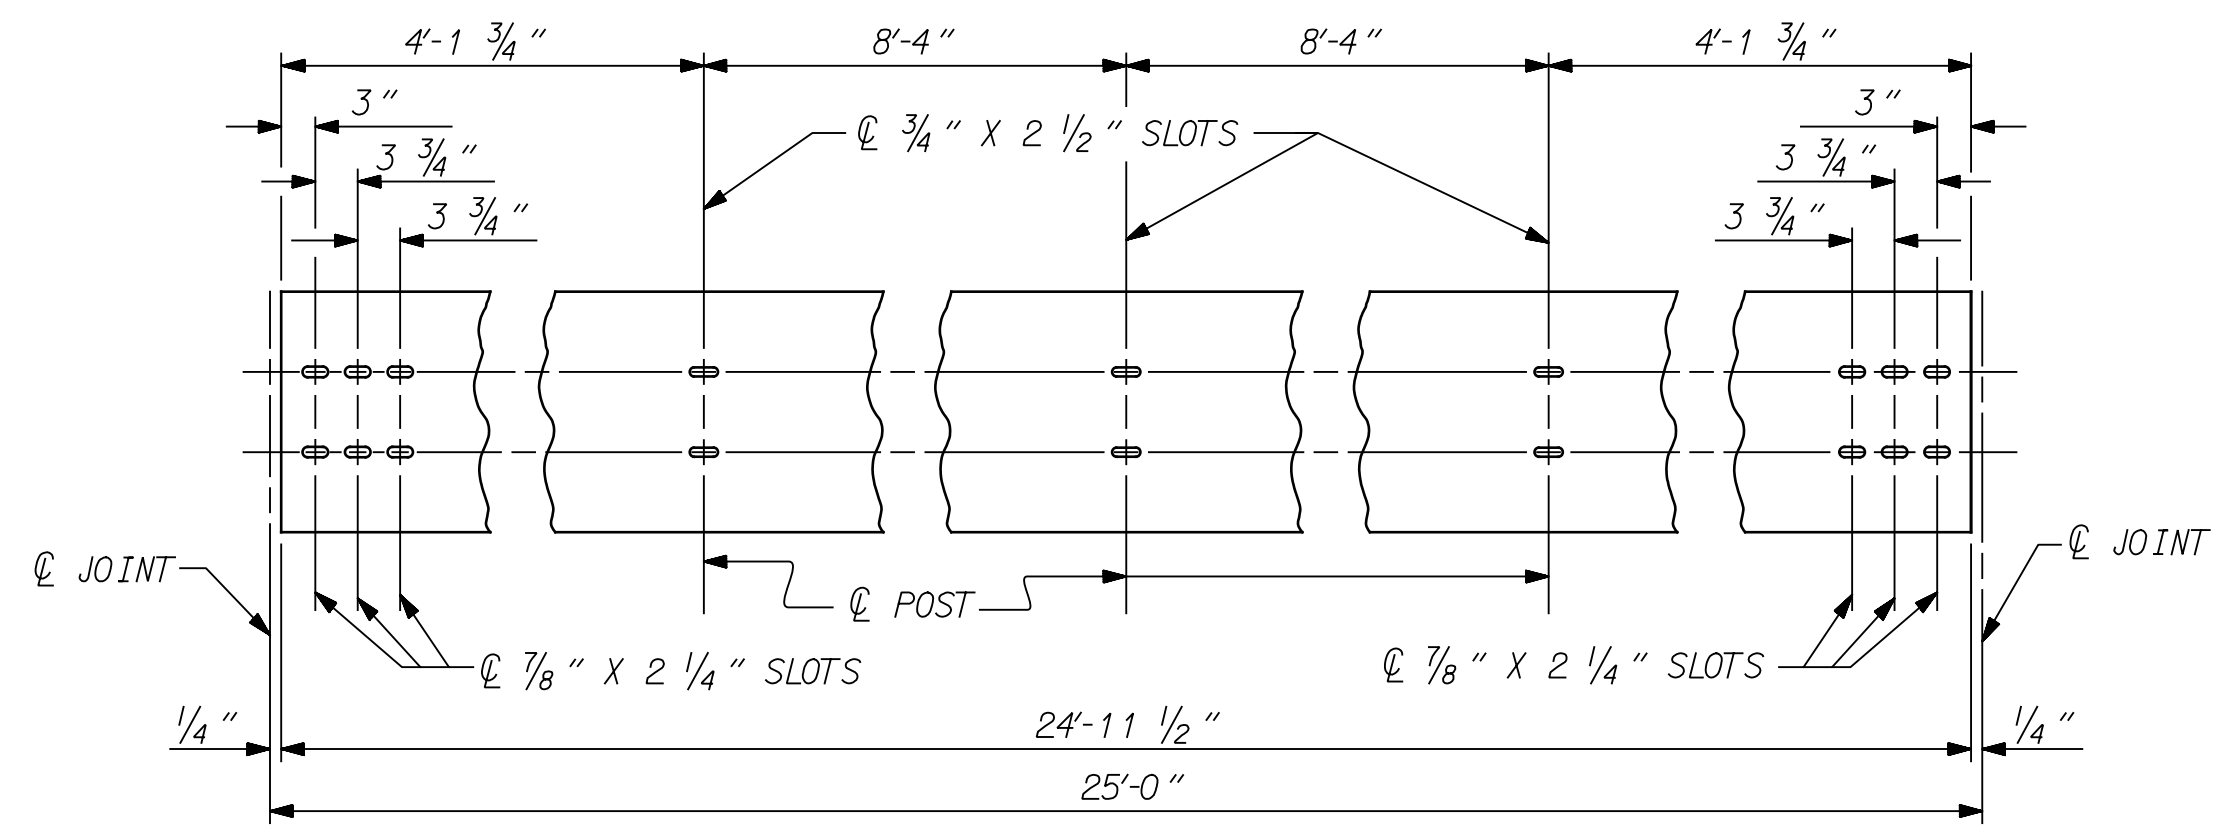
DETAILS FOR RETROFIT OF EXISTING BRIDGE RAIL WITH TUBULAR BEAM GUARDRAIL
